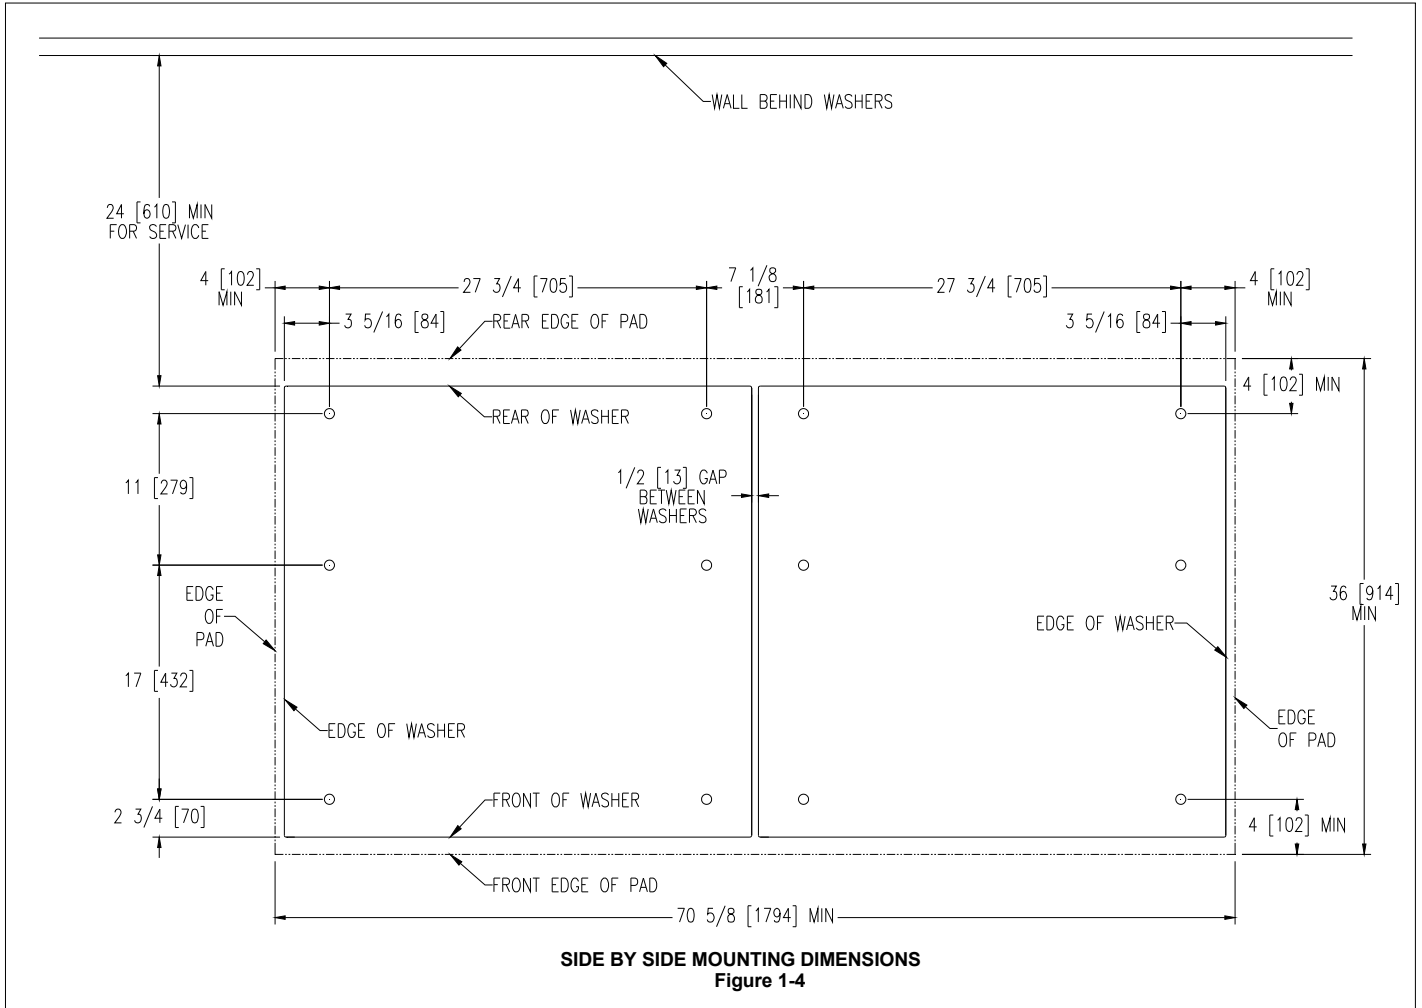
T-750 Machine Side By Side Mounting Detail
